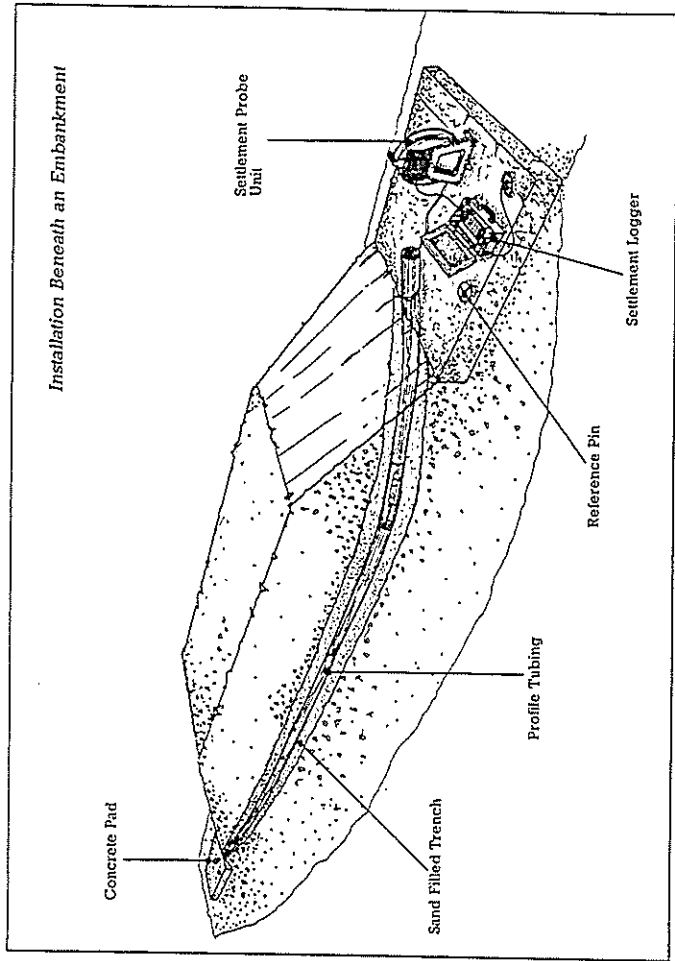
SCHEMATIC LAYOUT OF PROFILEMETER
